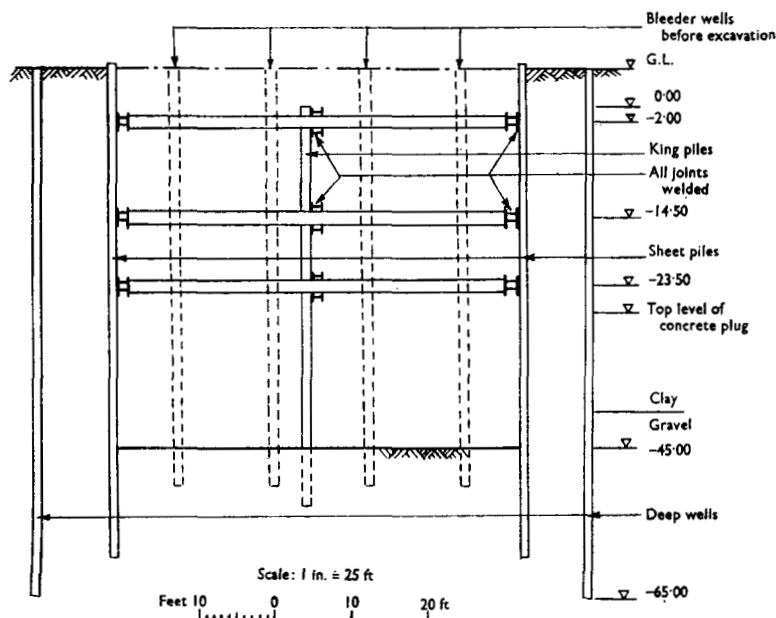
TYPICAL CROSS-SECTION OF EXCAVATION
